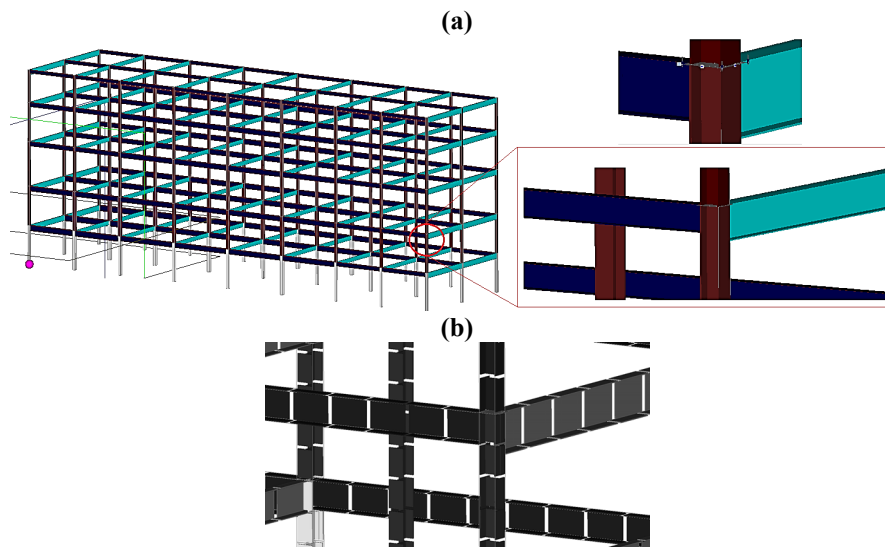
3D Model rigid joints with wide flange sections (a) mesh view (b)
